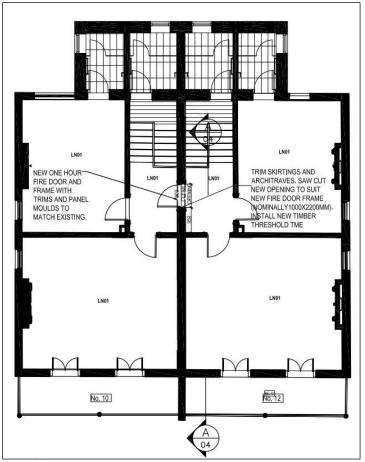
First floor plan (Source: Artefact Heritage and Environment)
